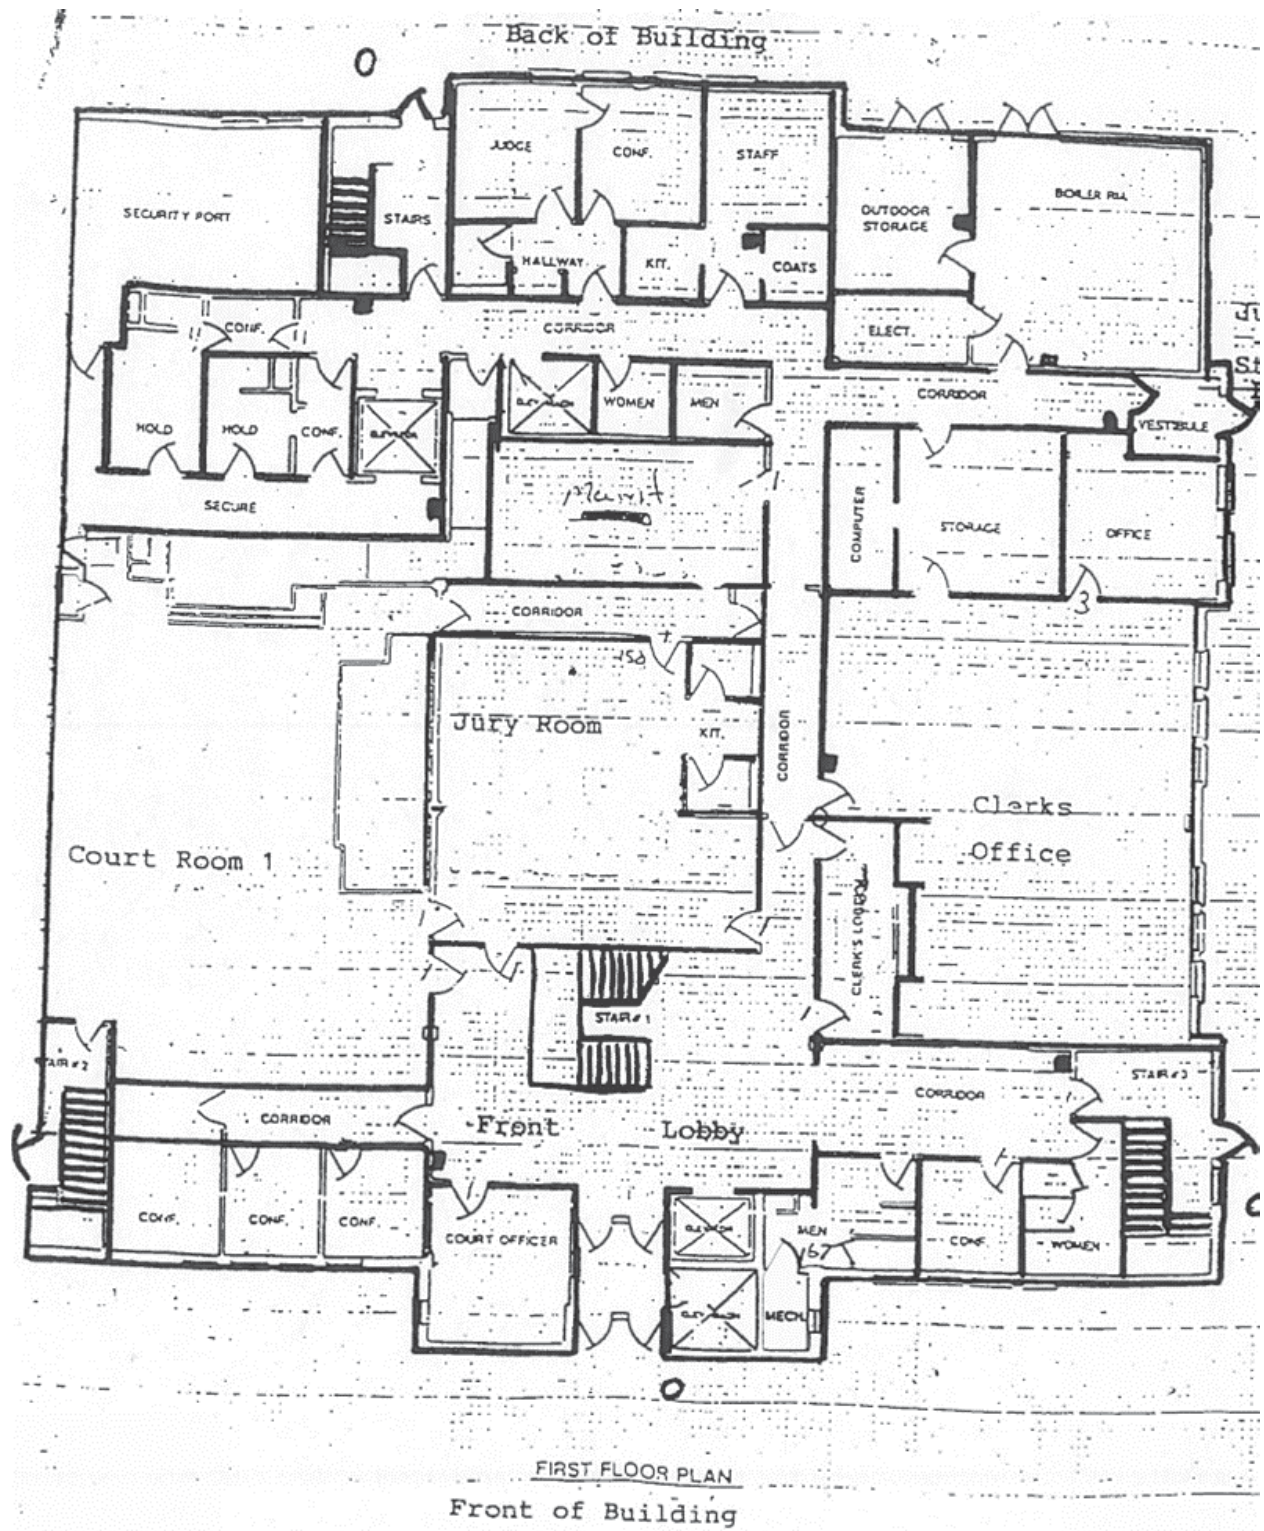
Building Floor Plan provided by BGS (N.T.S.).
